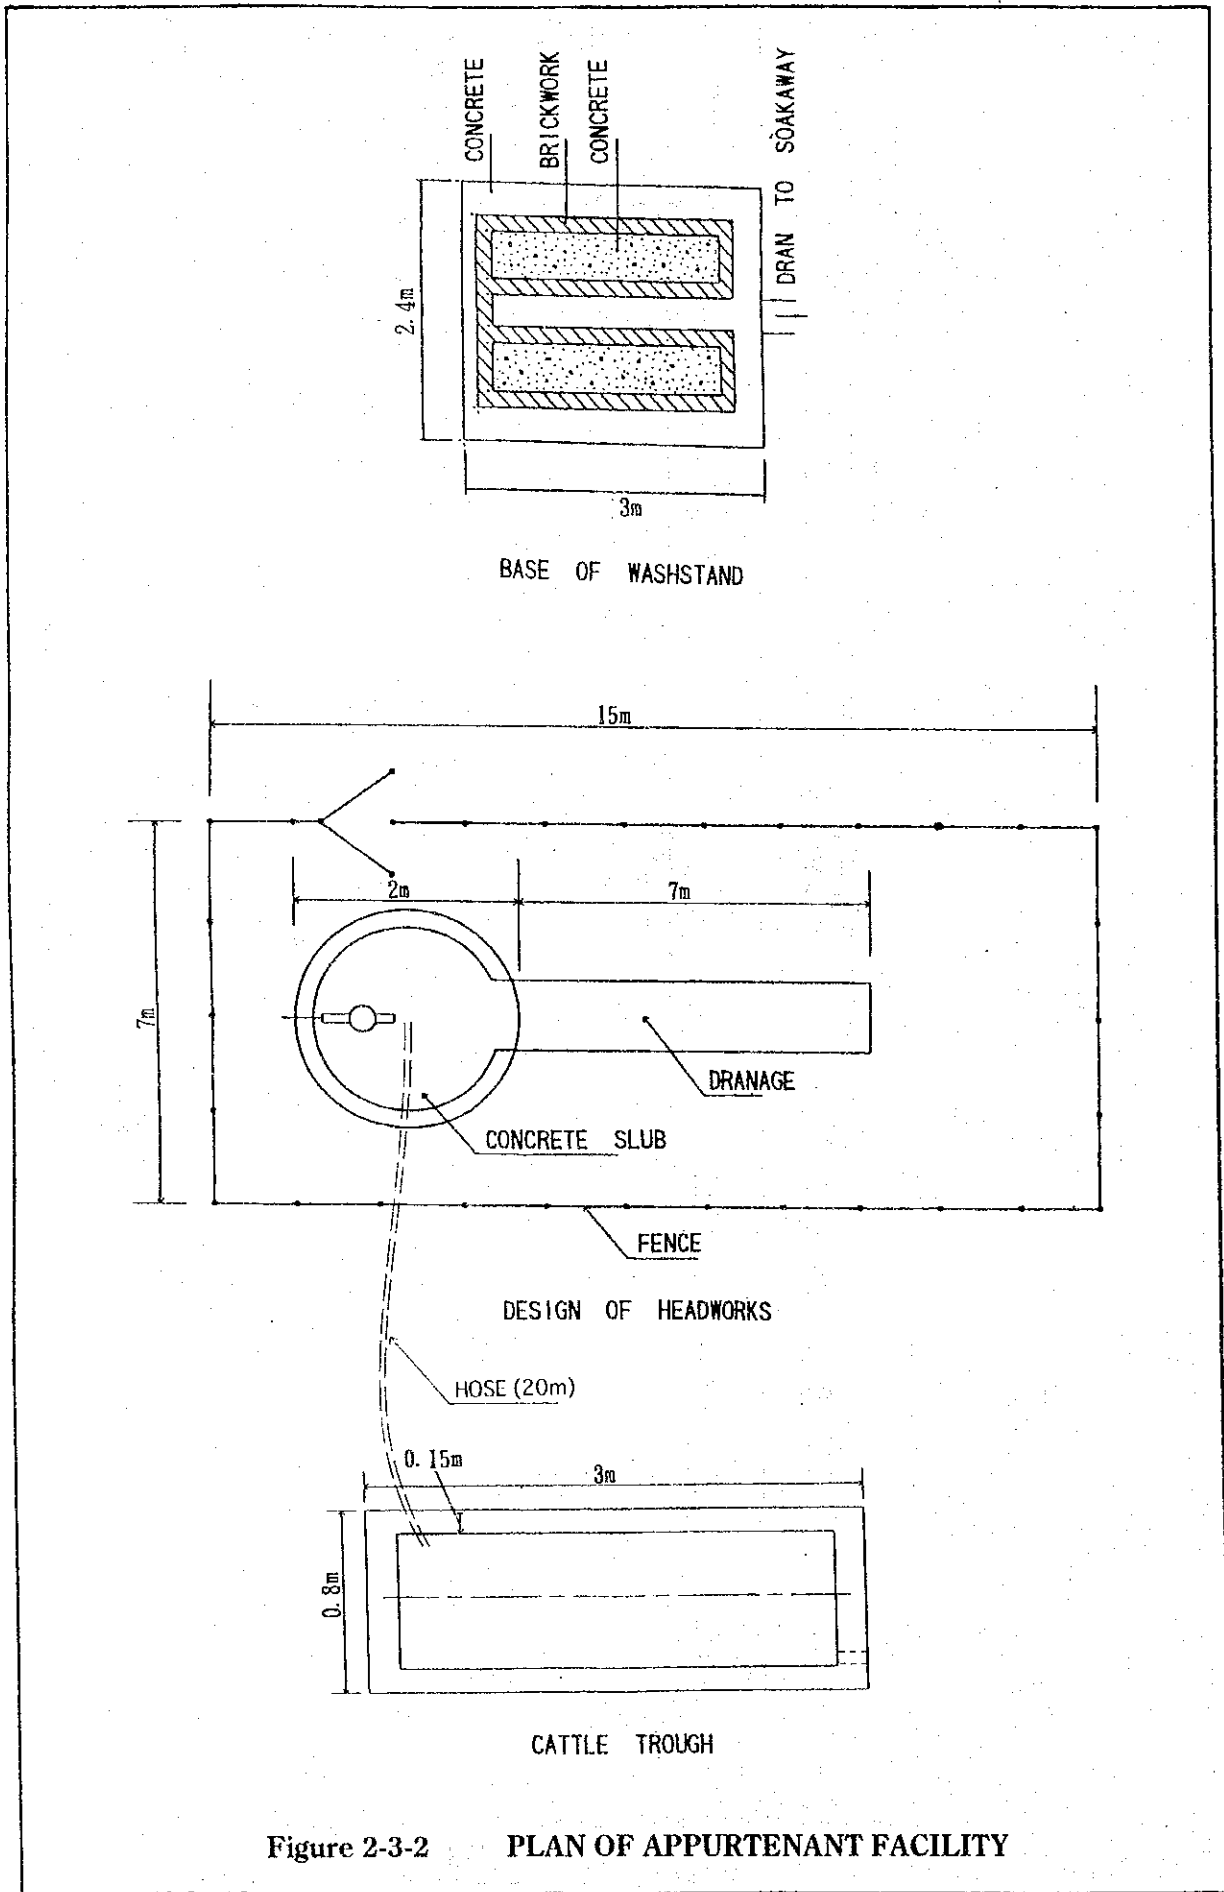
PLAN OF APPURTENANT FACILITY
